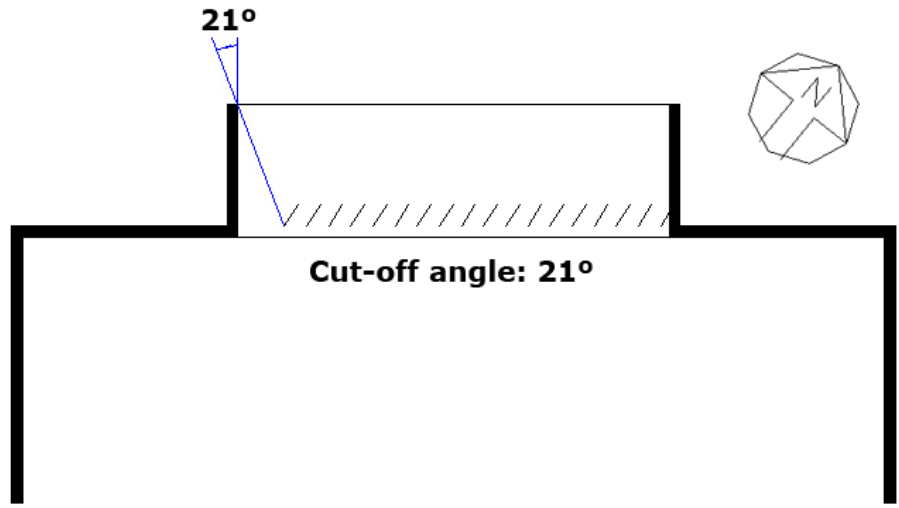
Plan view of vertical louvers for northwest facing opening in Building 3
